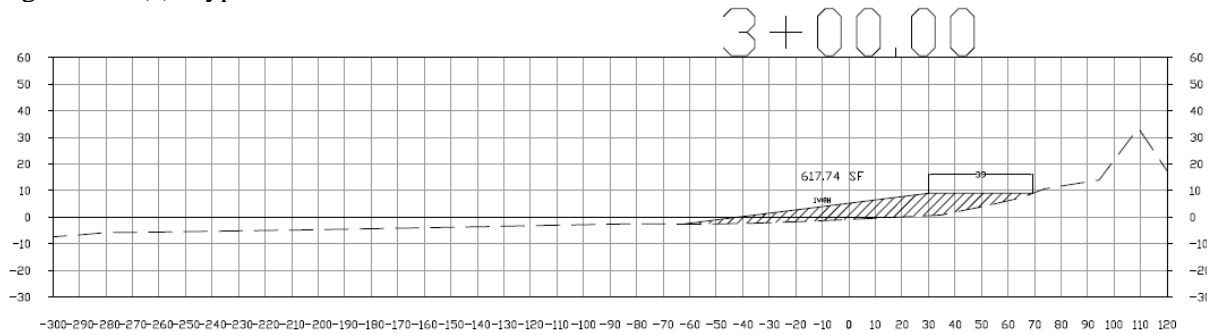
(b). Typical beach fill cross-section at Sta 3+00
